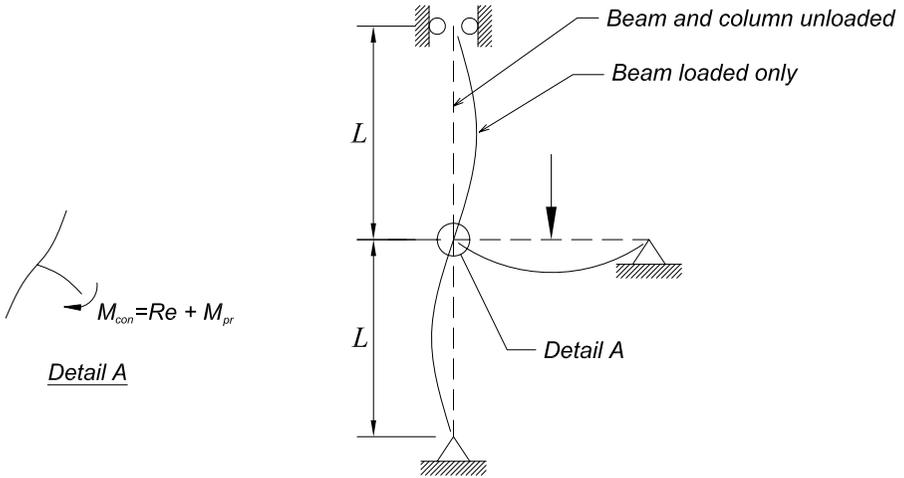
Illustration of beam, column and connection behavior under loading of beam only.
